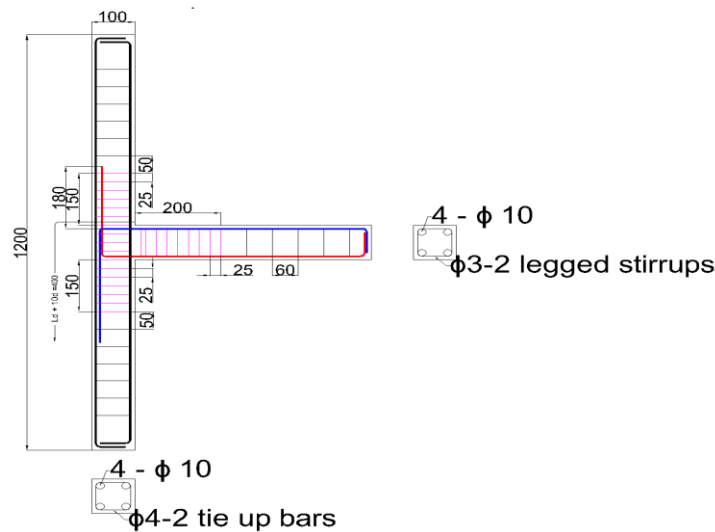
Reinforcement Detailing of the MODEL 1 (Source: R. Vidjeapriya1 and K. P. Jaya2 2013)
